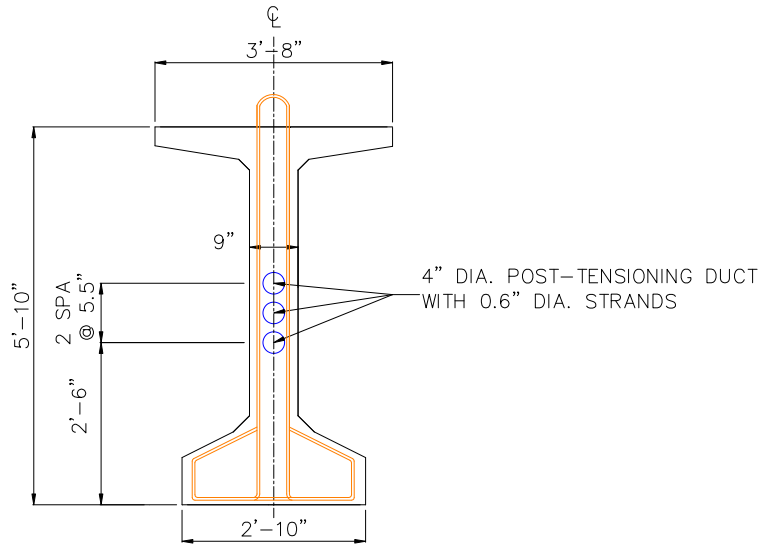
Prestressing Details for Shored Three-Span Girder.
